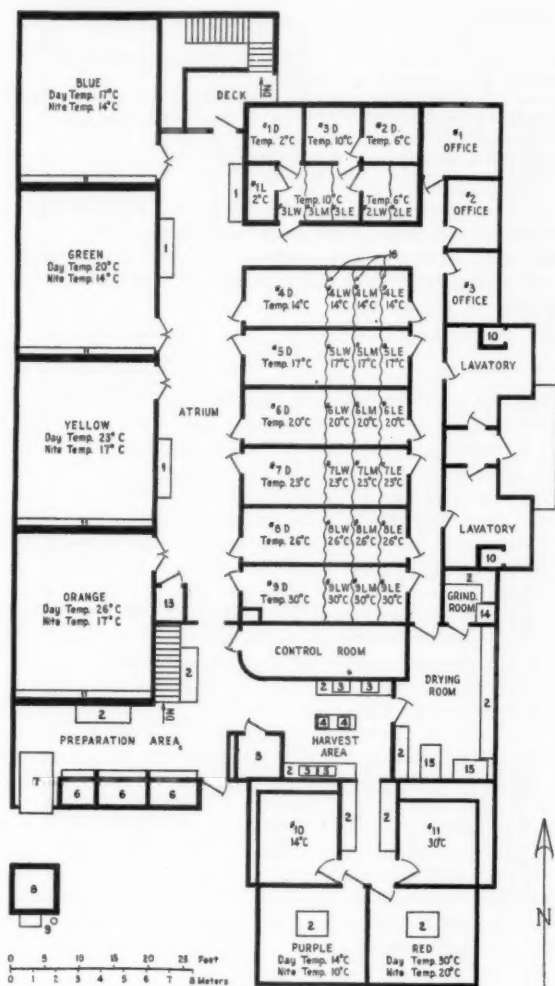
PLAN OF LABORATORY GROUND FLOOR
